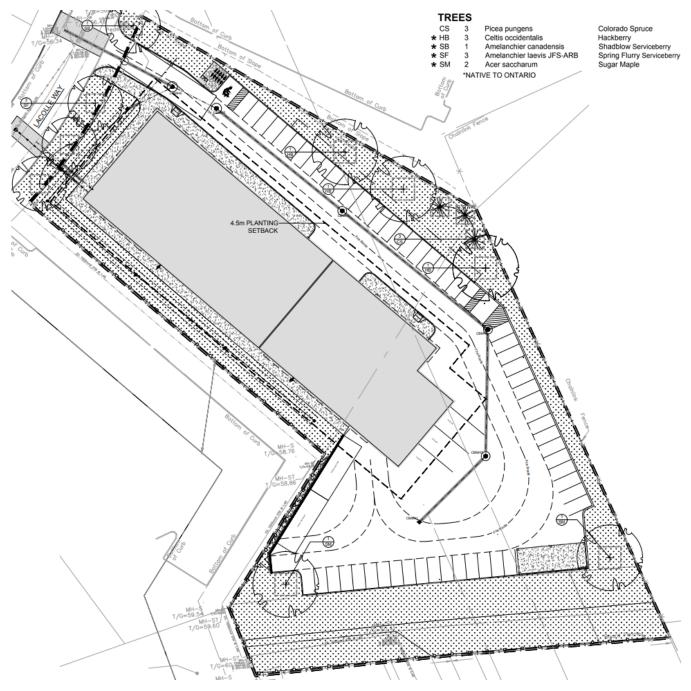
Excerpt of the Landscape Plan for the proposed development at 524 Lacolle Way
